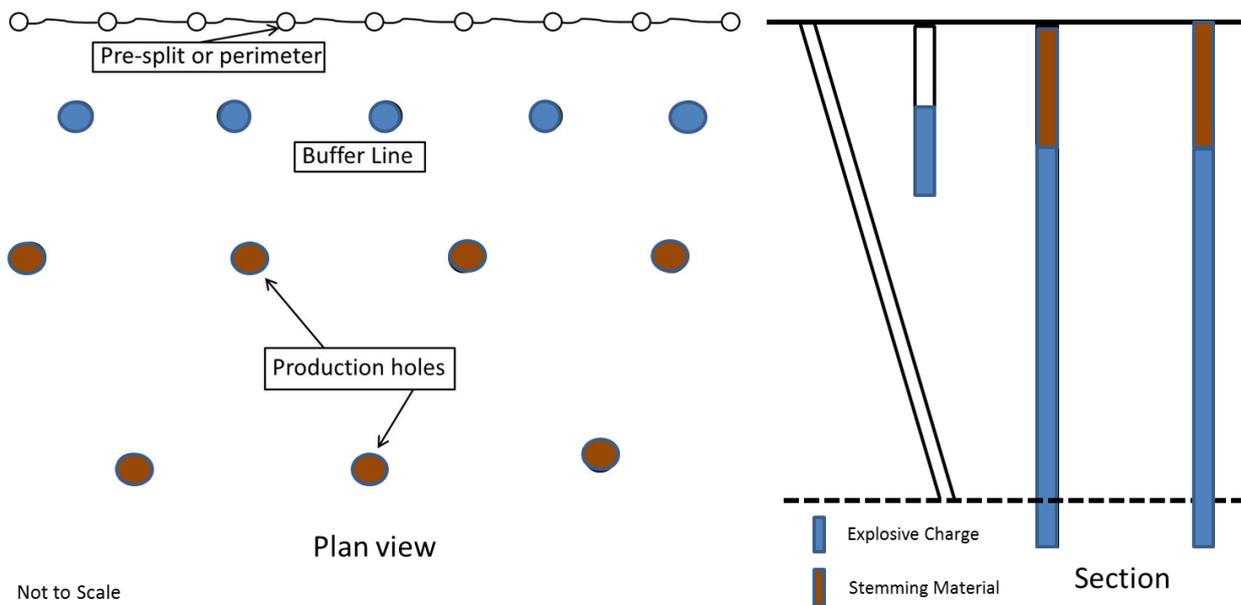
Buffer blast showing one row of buffer holes, lightly charged and unstemmed
